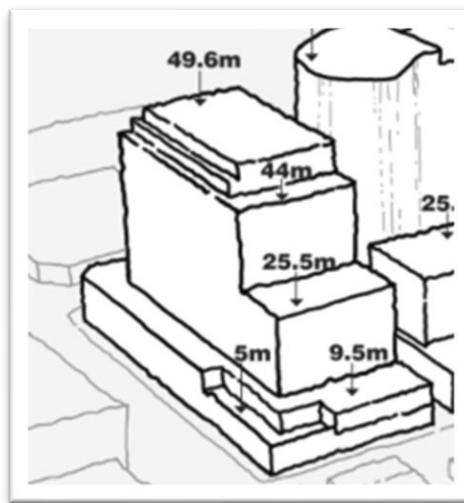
Height transition to the south in Building A. Source: Development Plan (Gurner 2023)
